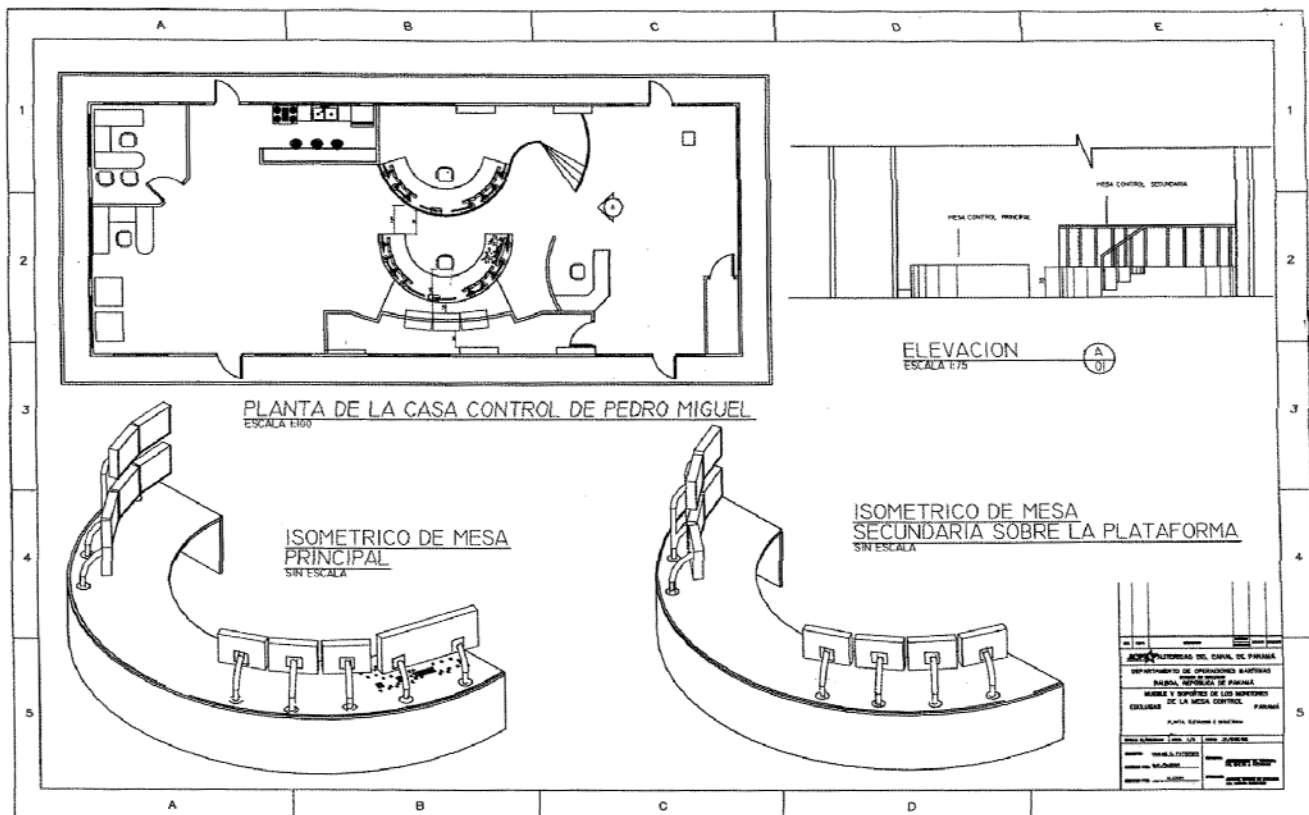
59 83-2: Elevation, overall plan view, and isometric views originally proposed for existing consoles
